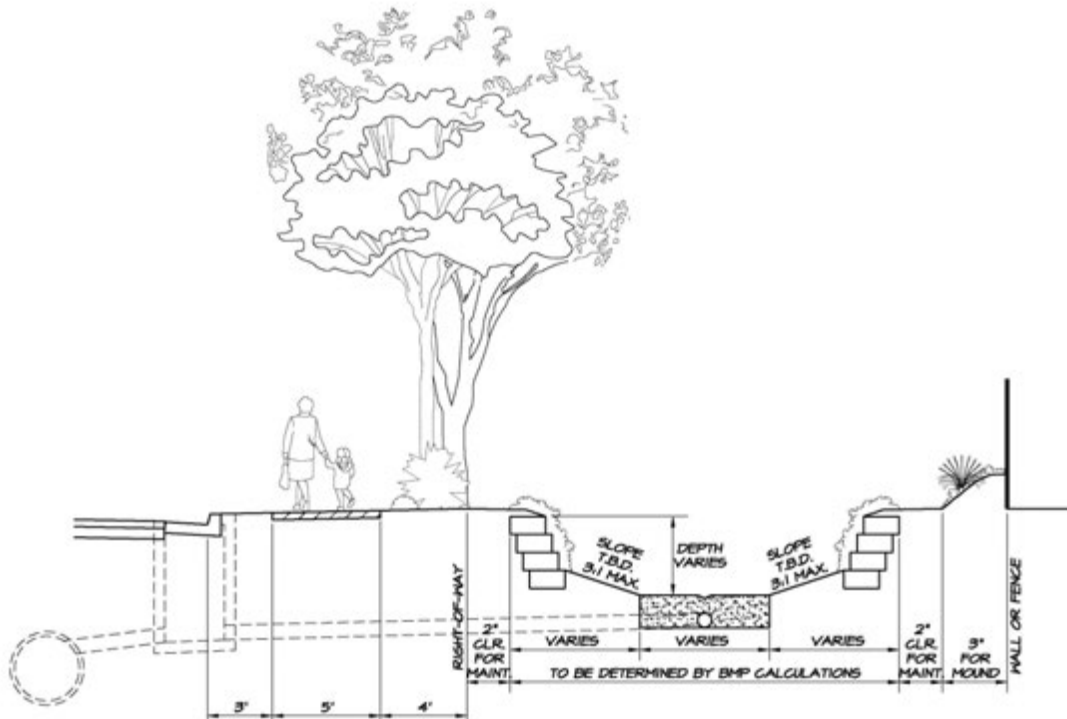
FILTER TRENCH DETAIL 12-FOOT PARKWAY WITH PLANTABLE WALL
